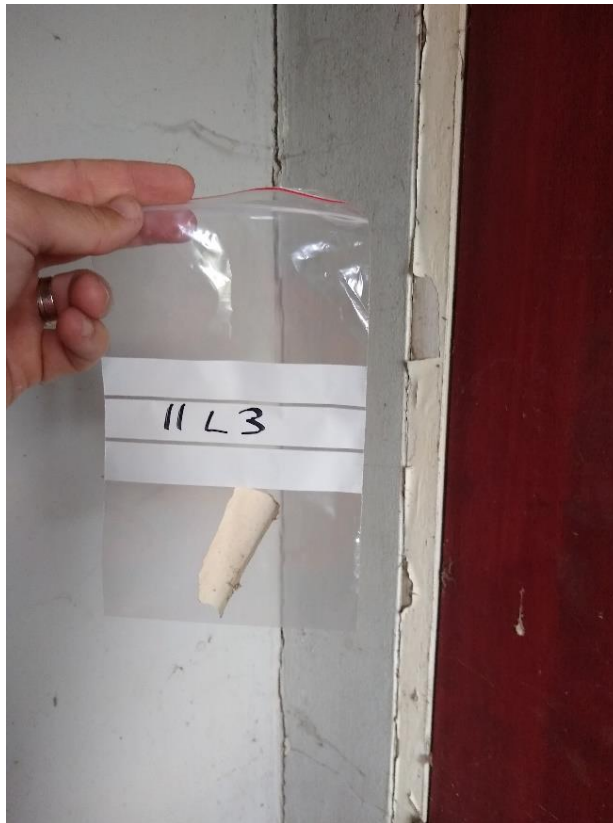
Building 11, interior, paint off timber door frame in south western portion of house, white paint, sample 11L3, lead paint(s) identified
